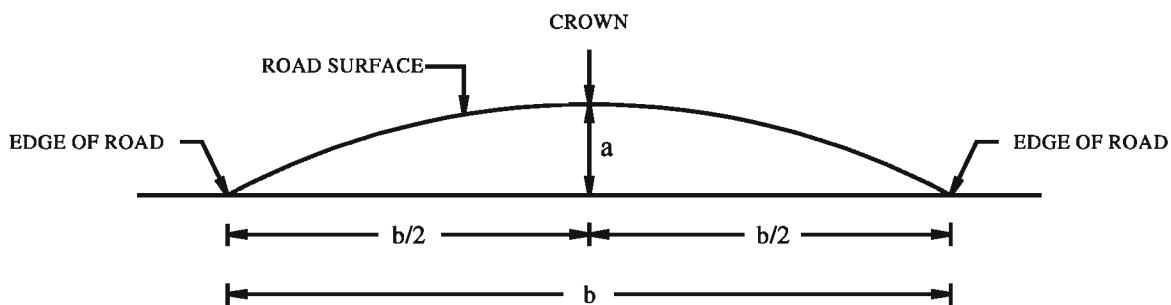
CAMBER OR CROSS-FALL OF ROAD SURFACE
